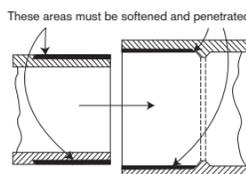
Solvent Cement Coatings of Sufficient Thickness Applied Uniformly around Pipe and inside Fitting Socket
